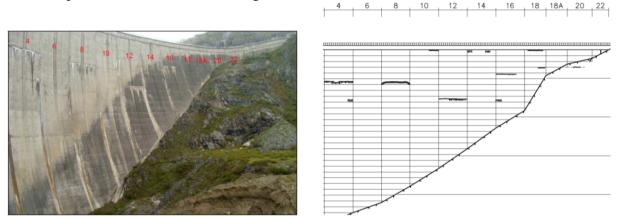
Photograph of the downstream side of the Drossen dam (left), corresponding CAD drawing showing defect locations (right, Verbund, 2011)
